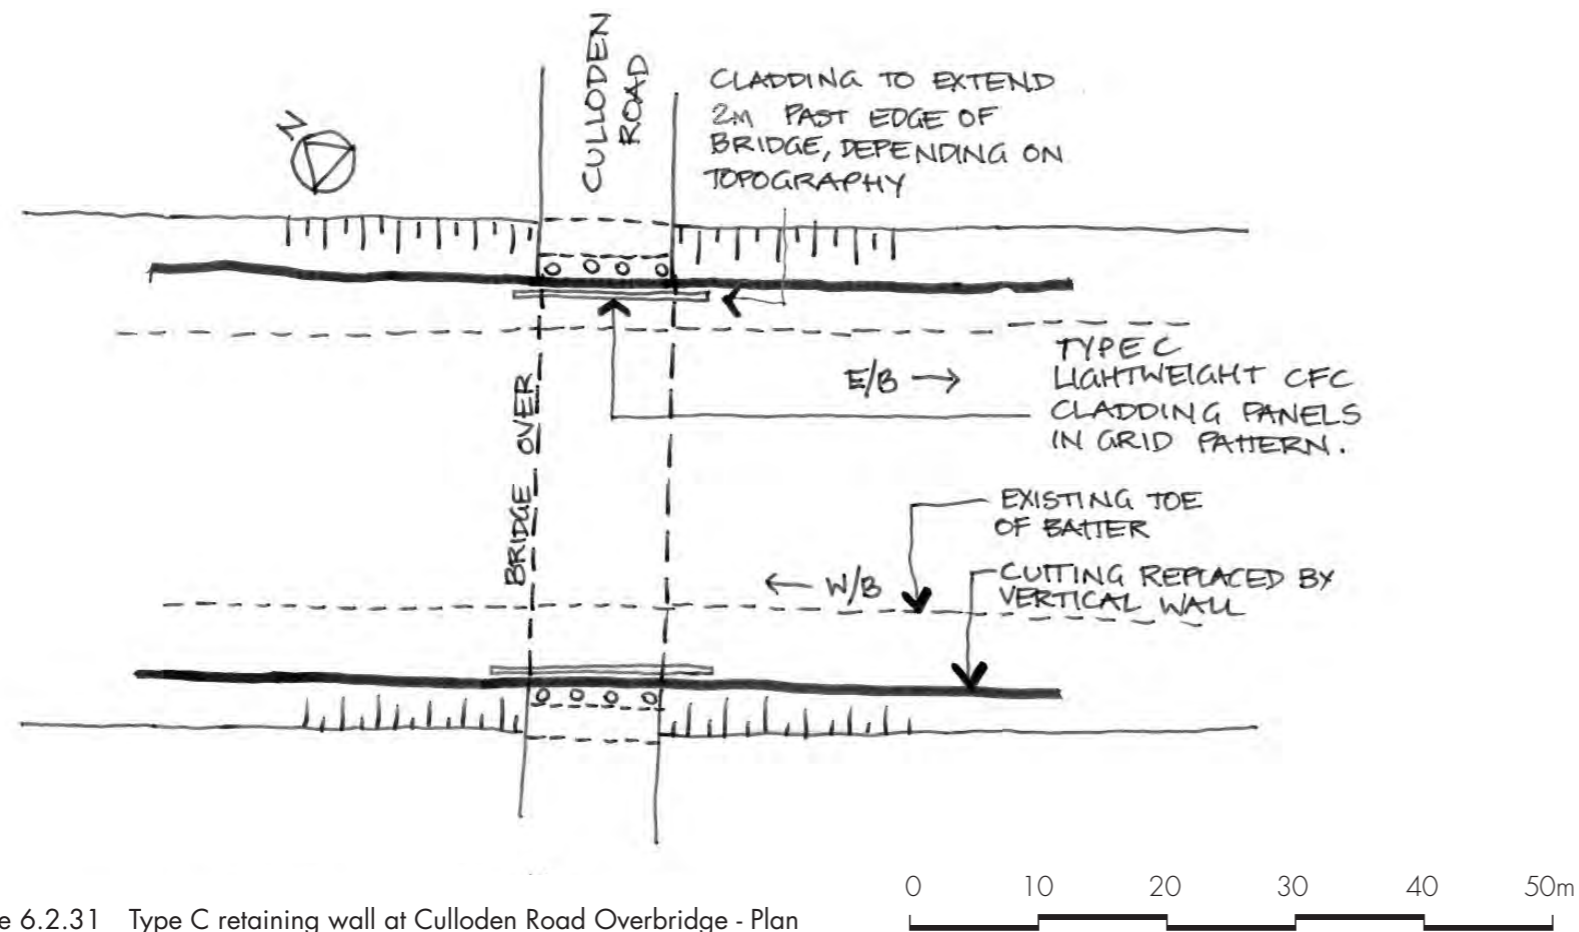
Type C retaining wall at Culloden Road Overbridge - Plan
